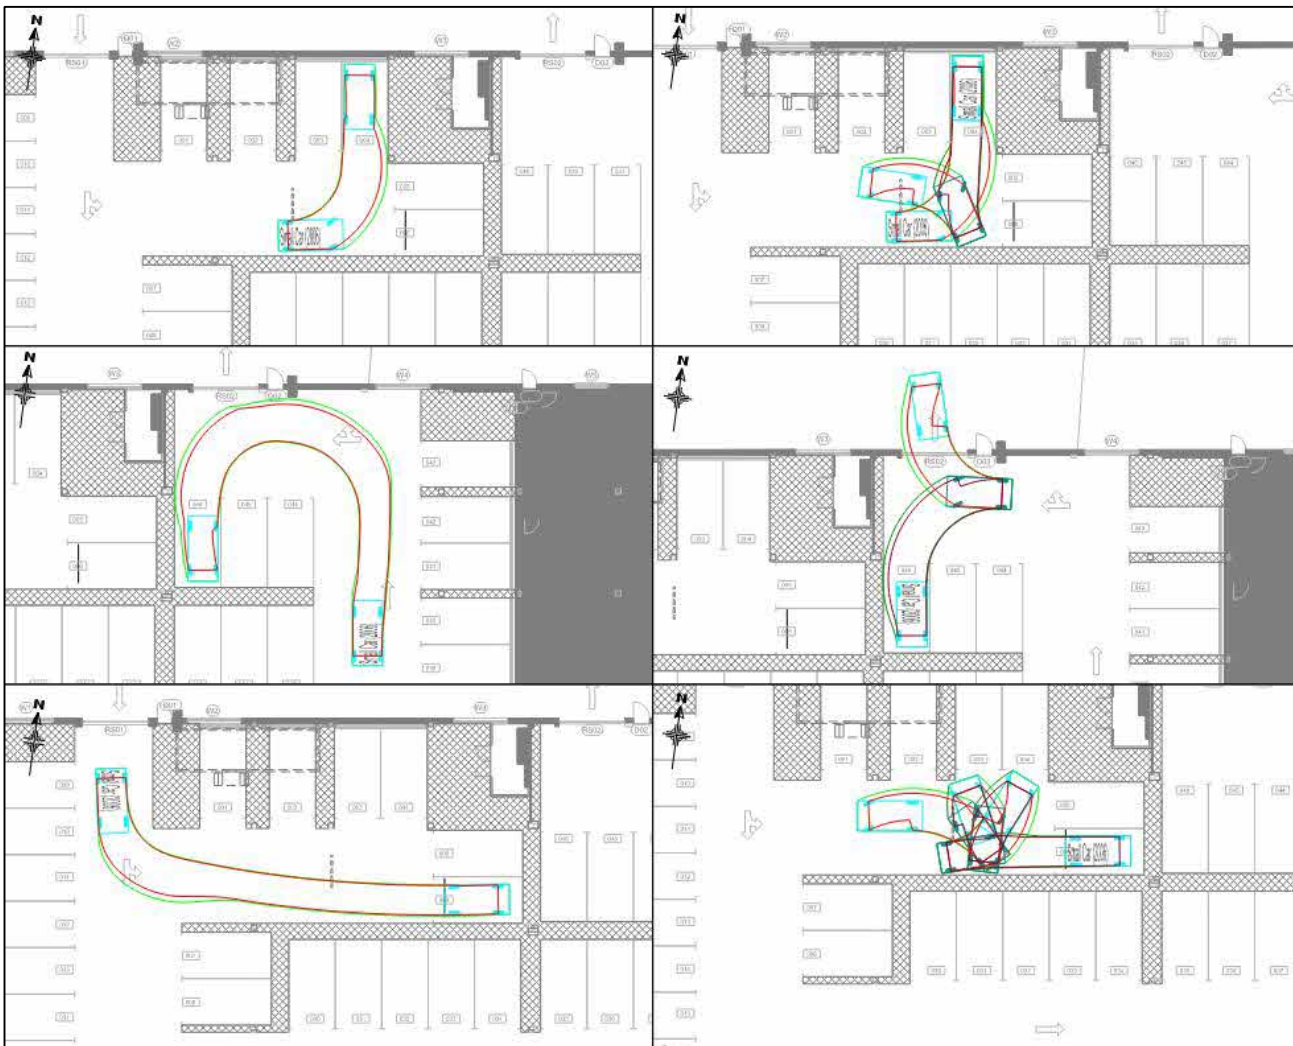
Car entering and exiting the proposed car park and accessing/egressing from bays
